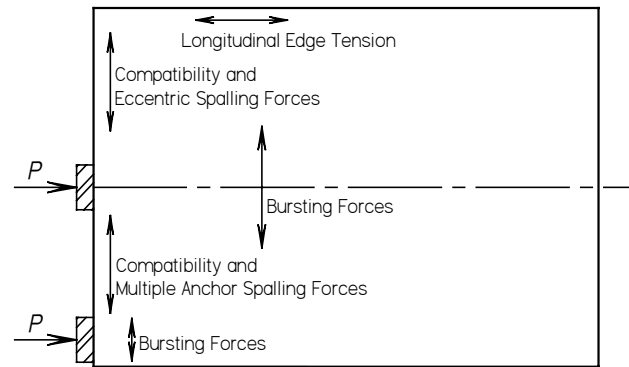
TENSION IN ANCHORAGE ZONE
